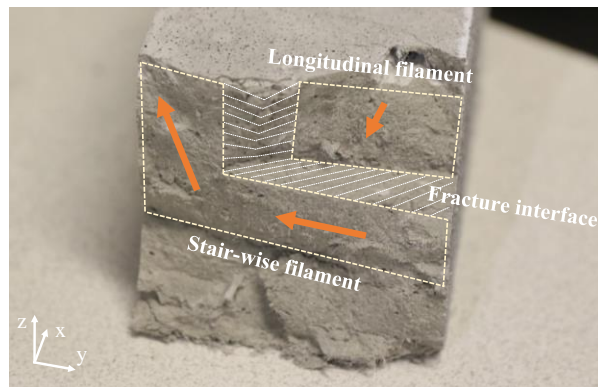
Fracture surface of knitted ECC (the specimen was loaded to complete fracture).
